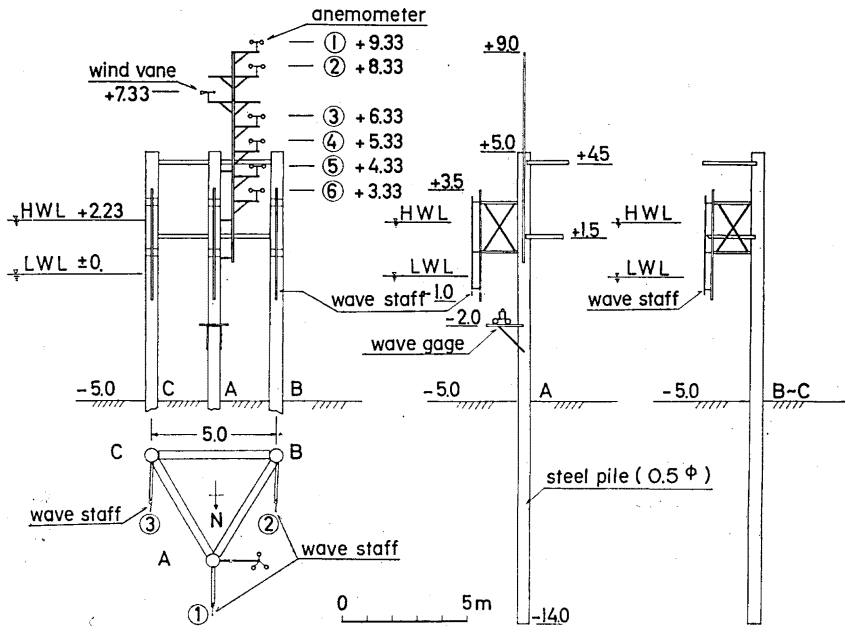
Observation tower at Hakata Bay. (Unit in m)
